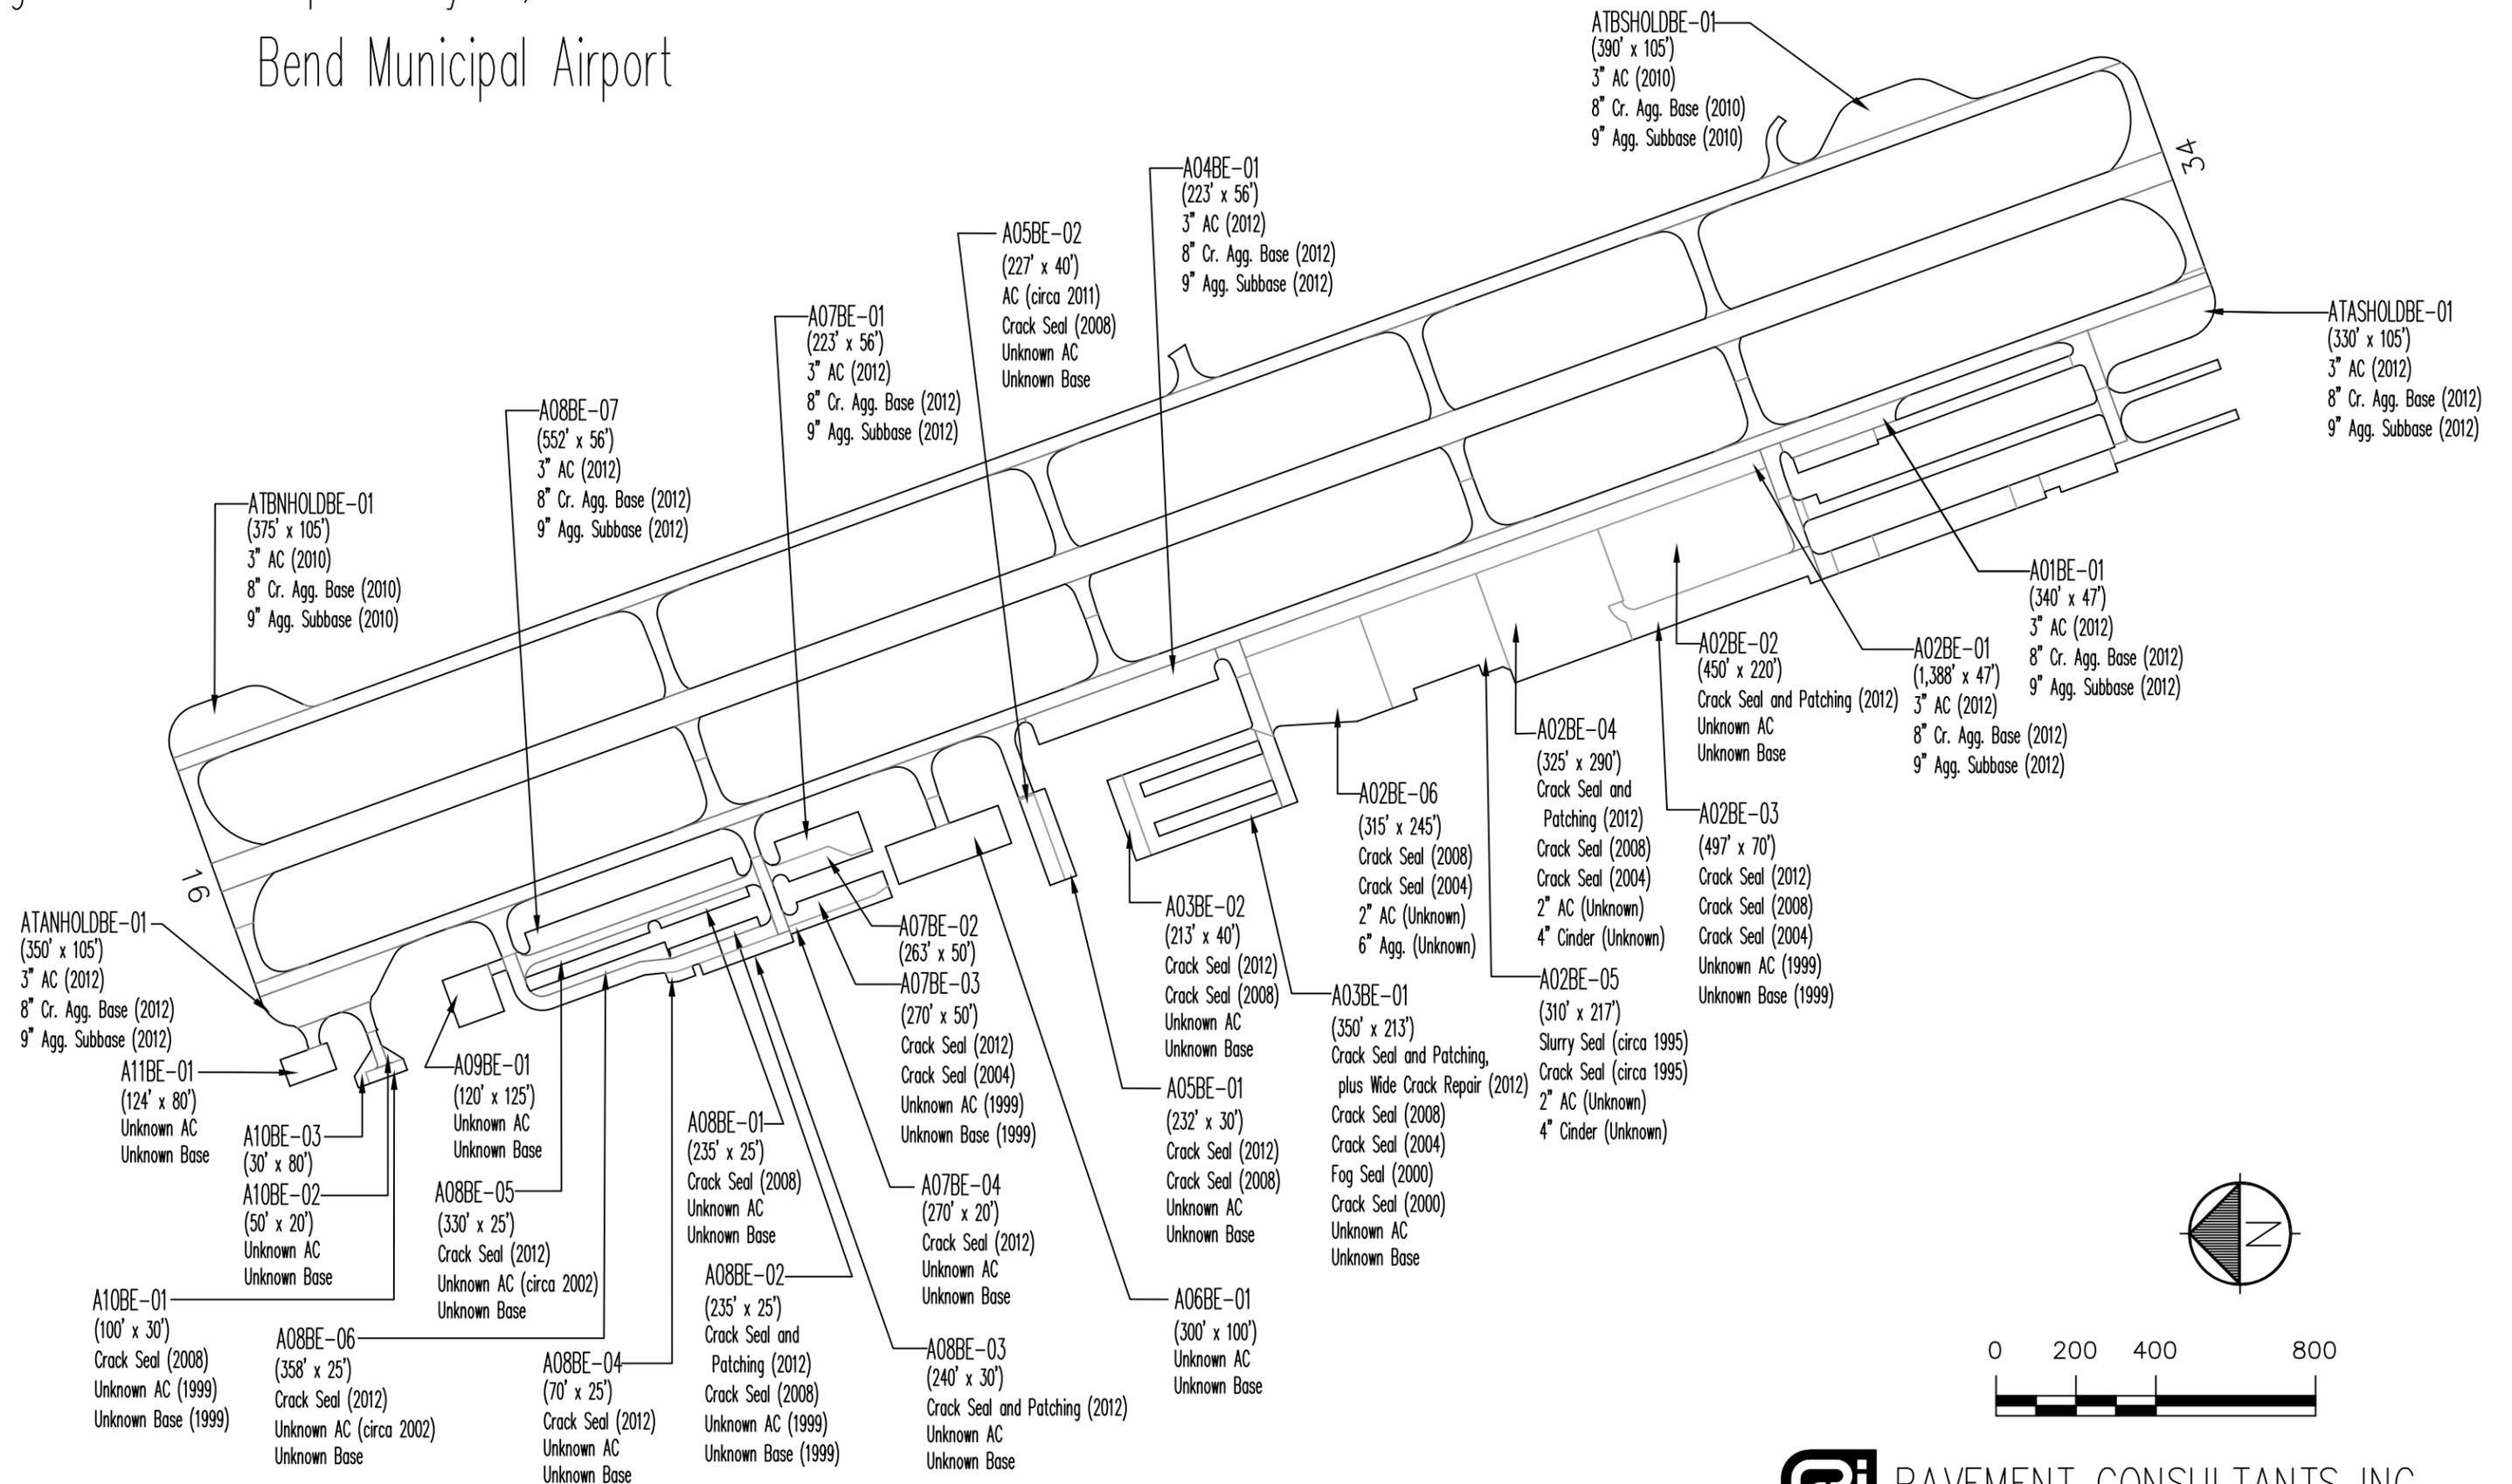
B. Airport Layout, Dimensions and Pavement Cross-Sections.
